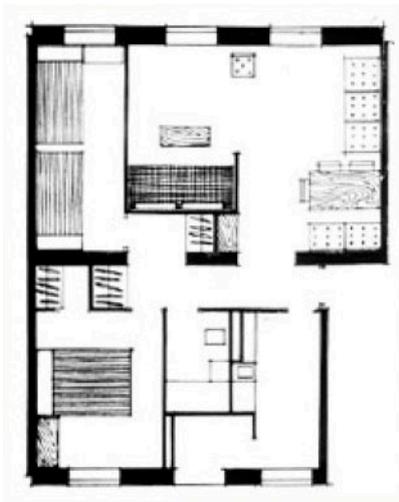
Batán*, 3-bedroom apartments. Floor plan variation.
